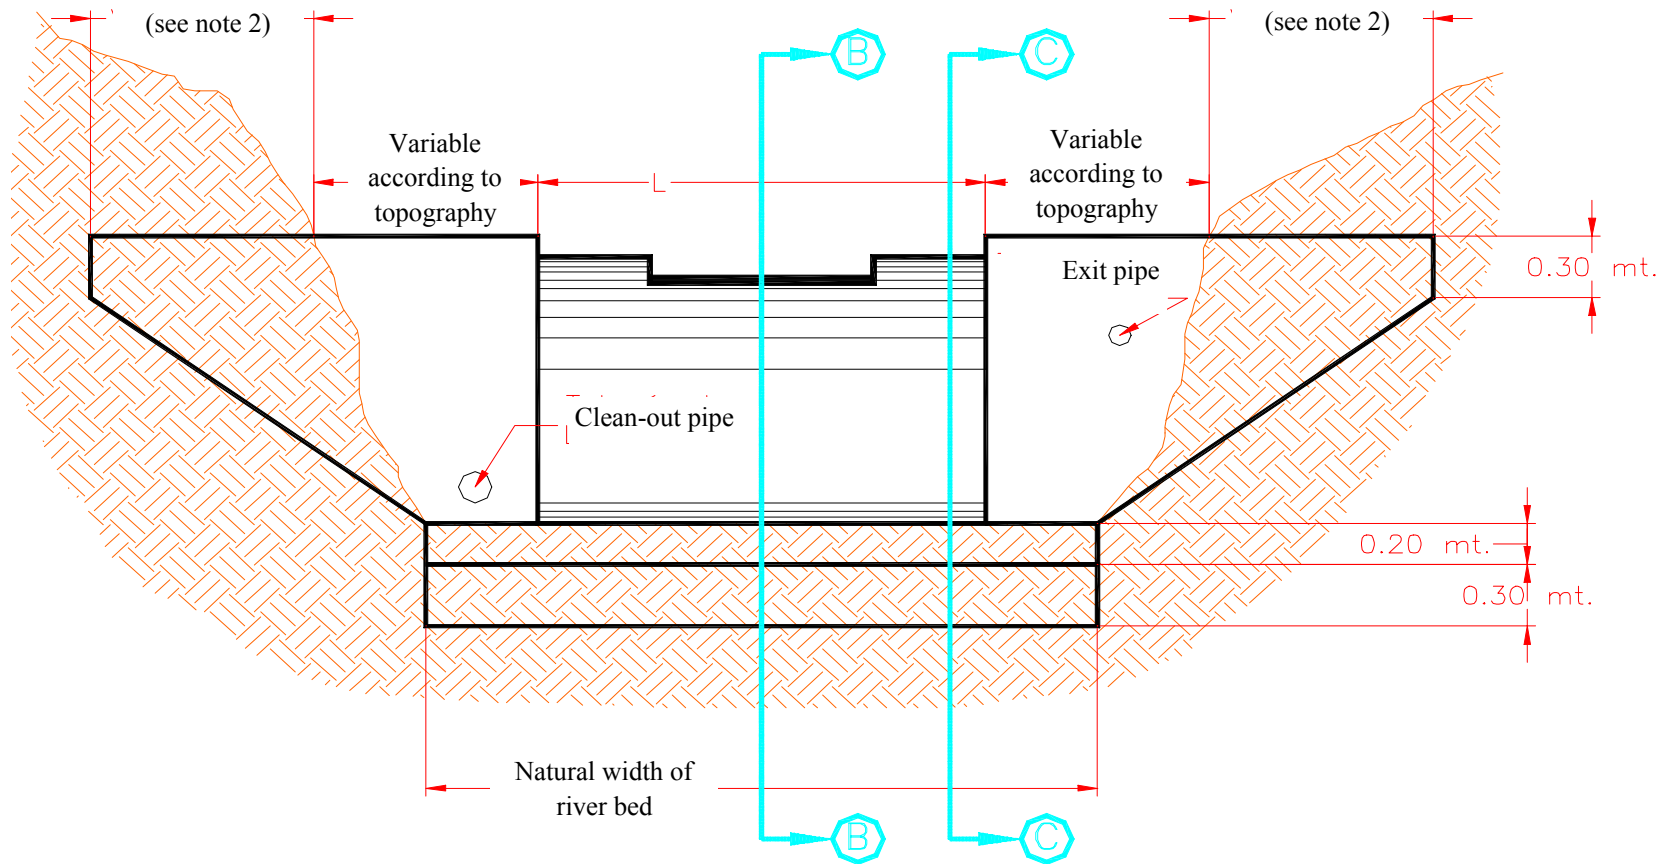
Front view of dam with details on weir dimensions and concrete mixes.
